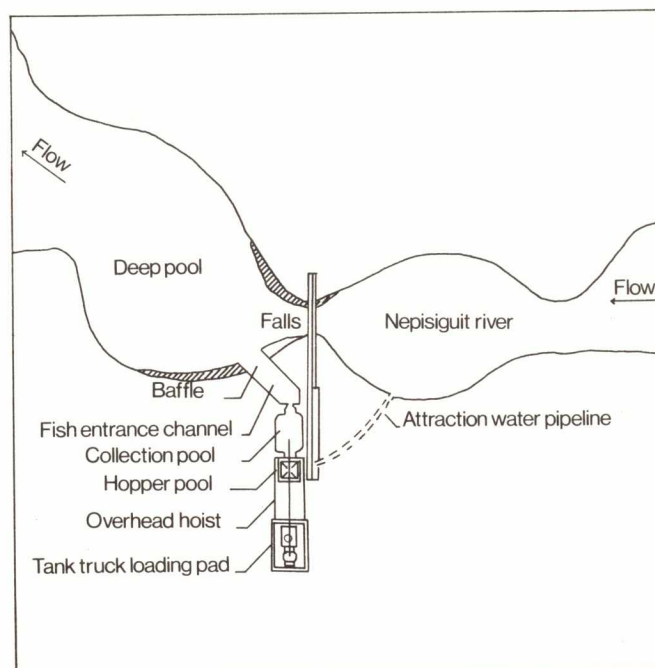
Site plan for proposed fish pass facilities for Nepisiguit River, New Brunswick.
